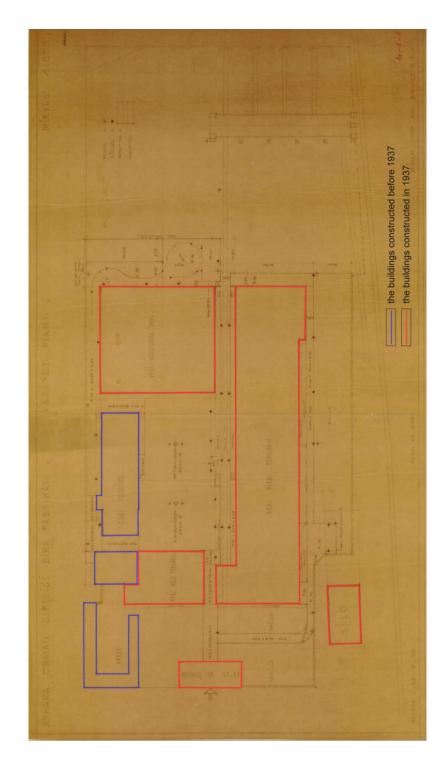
1937 dated site plan drawn by Ernst Egli, demonstrated by the author (Source: T.T.A Archive)
